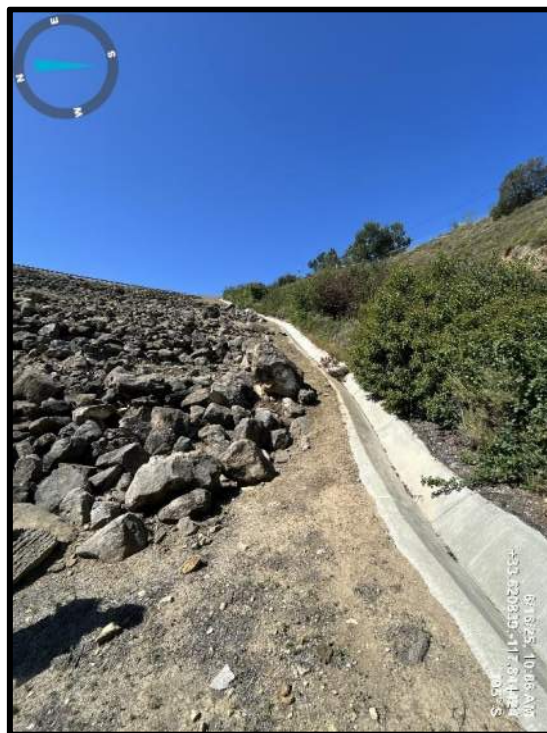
V-ditch at left groin. View looking upstream from the middle downstream bench.
